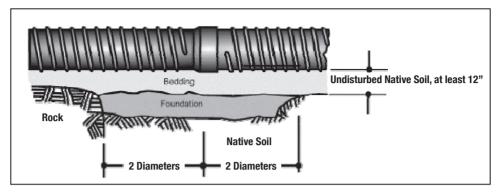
Proper Transition from Rock Trench Bottom to Normal Trench Support
